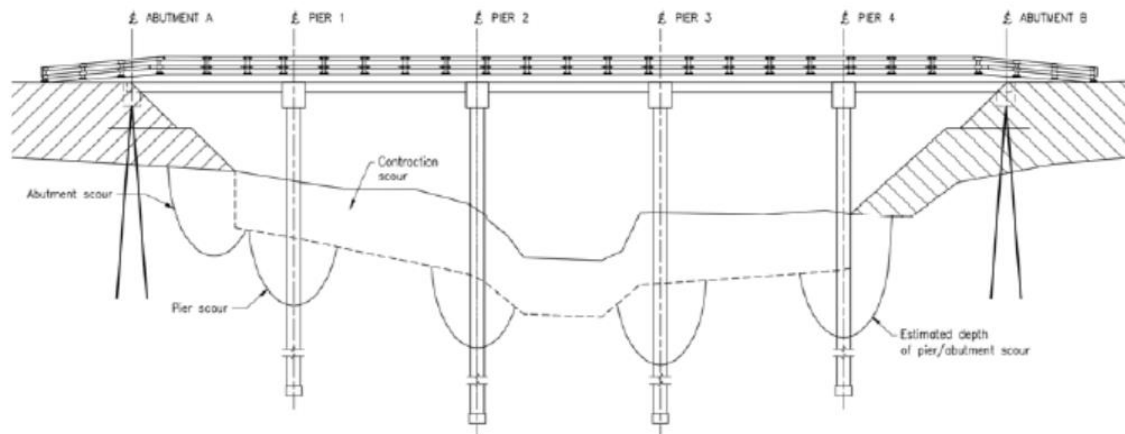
Constriction and Pier scour pattern at a typical bridge (Dot, 2013)
